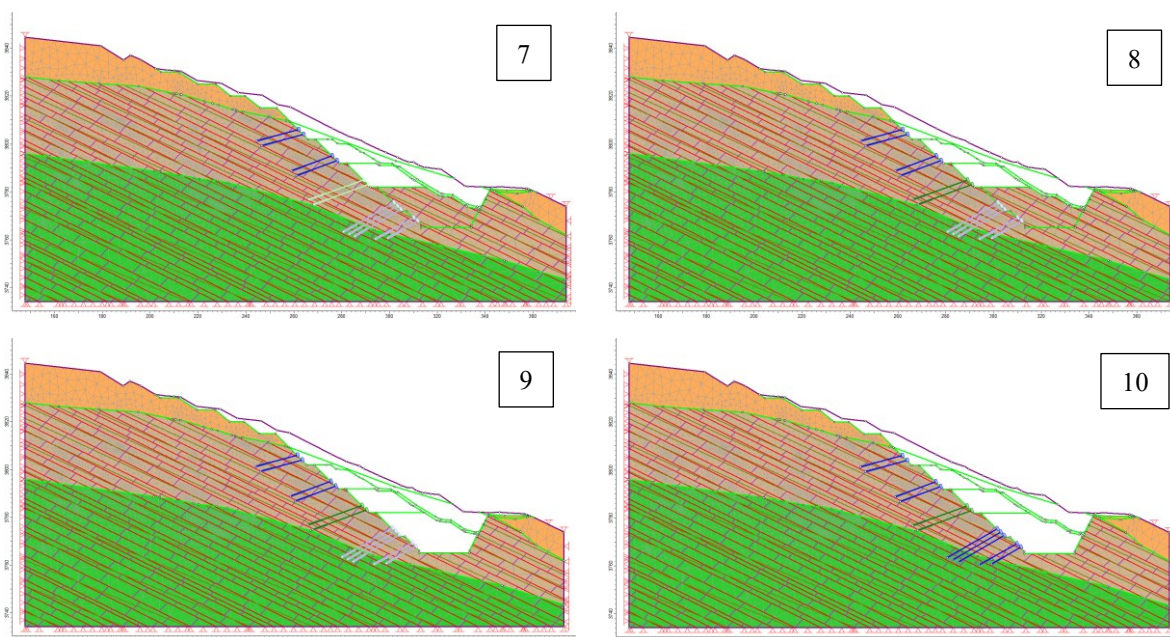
Construction sequence of the slope carried out in 10 stages with alternating excavation and application of the designed support.
